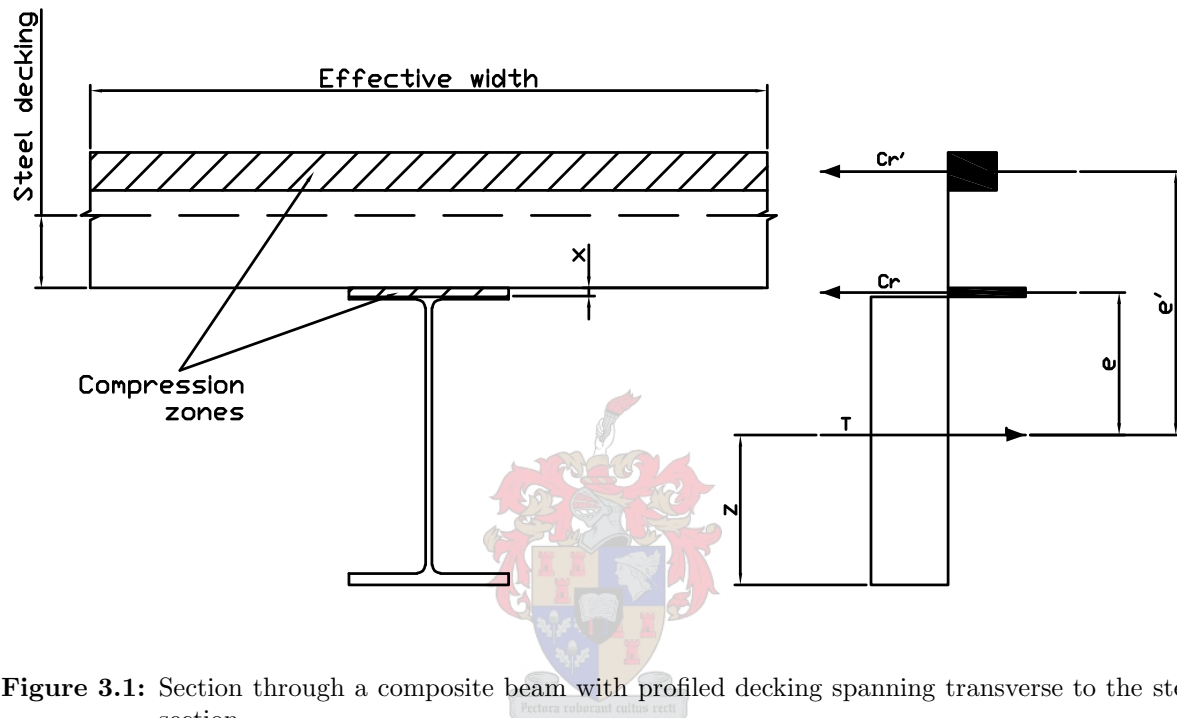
Section through a composite beam with profiled decking spanning transverse to the steel section
